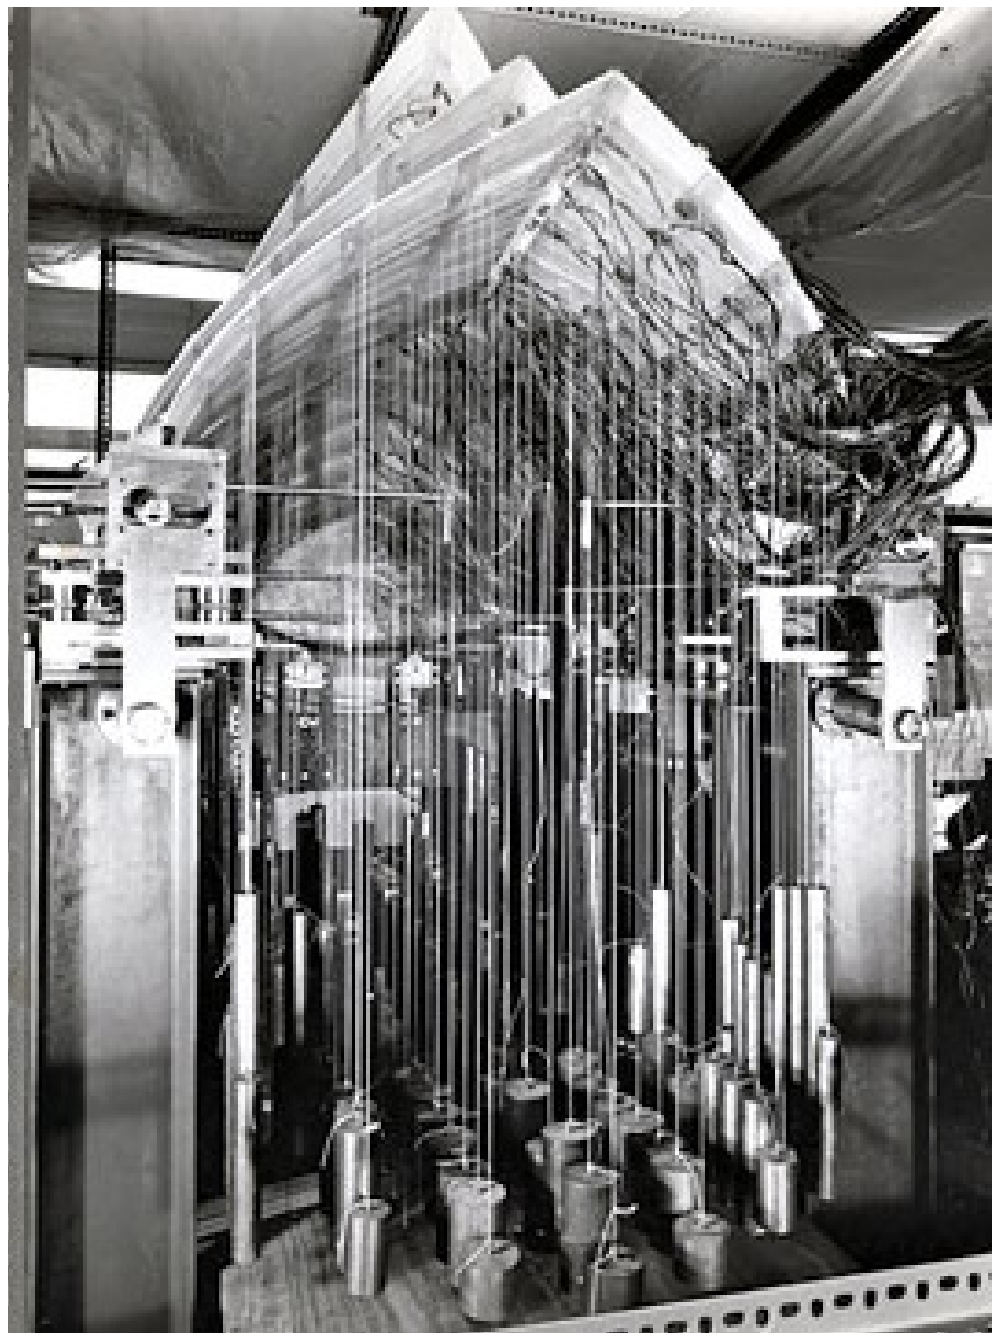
Arup. Sydney Opera House structural roof model B under vertical load testing at Southampton University, 1958.
